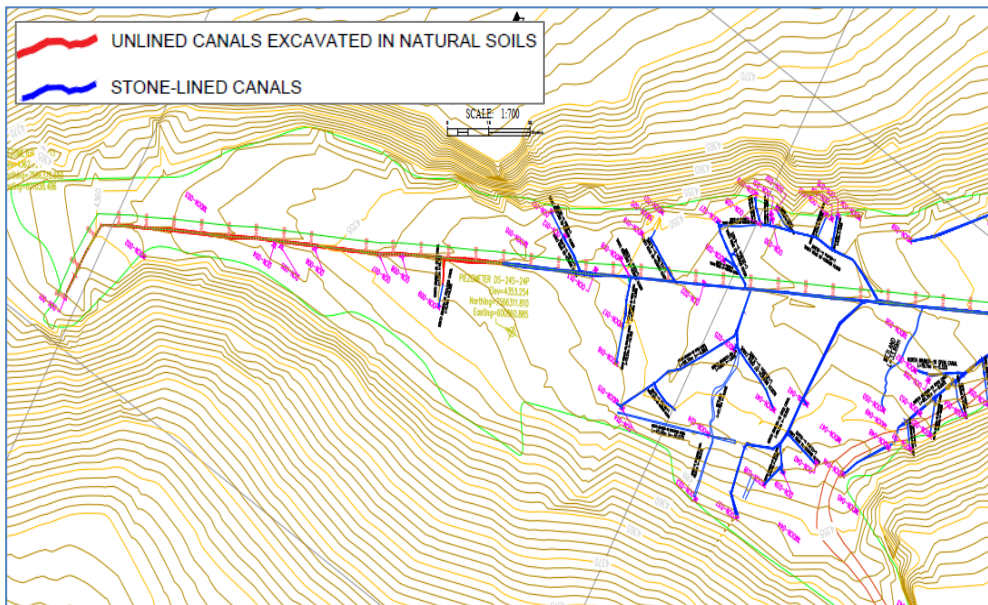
Layout Plan and Profile of the North Canal of the Silala N° 14-16.⁷⁹
